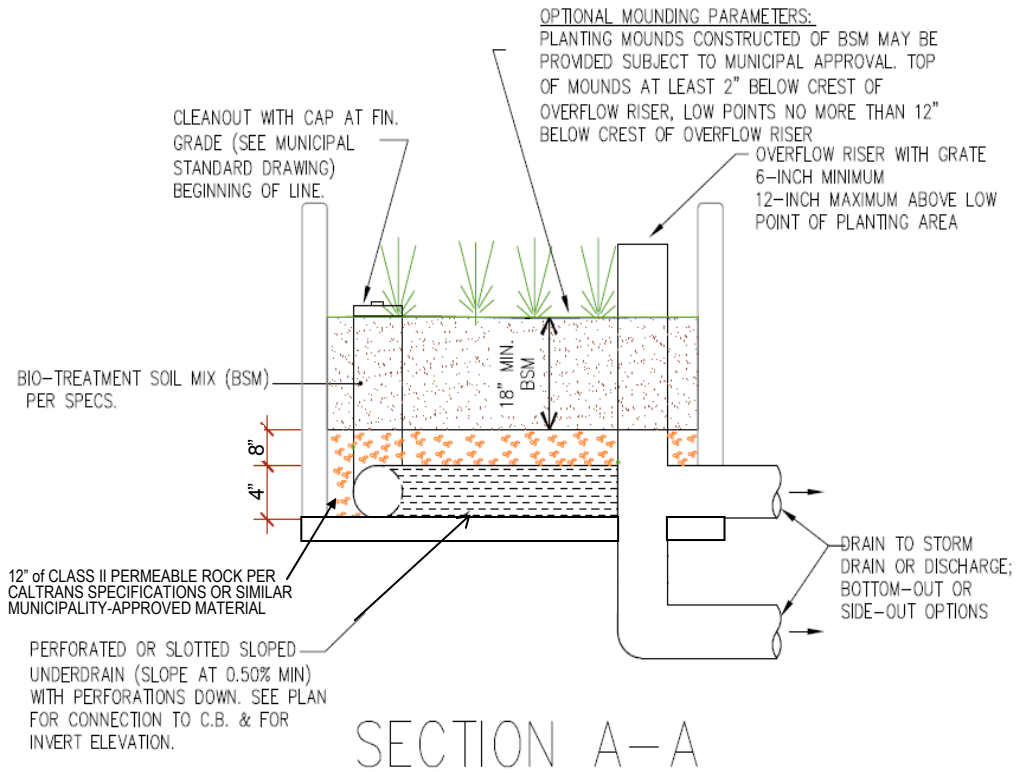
Cross section A-A of flow-through planter, shows side view of underdrain (Not to Scale)
